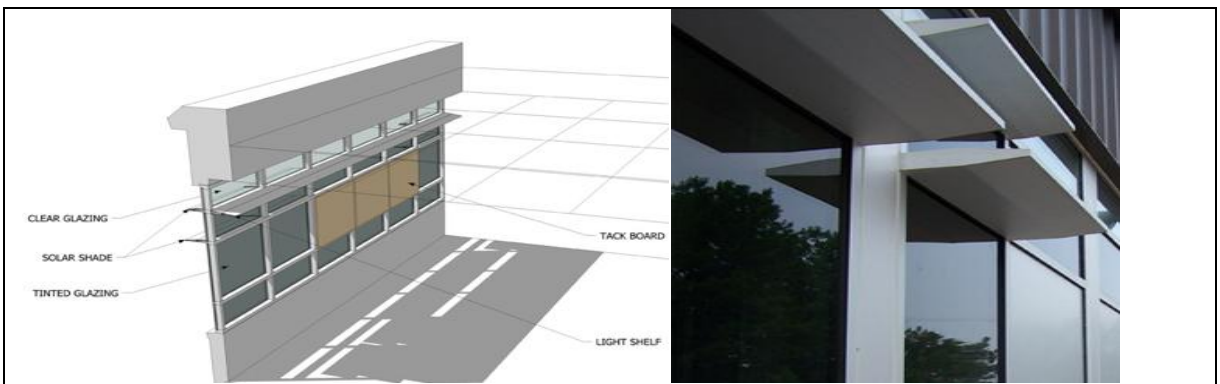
The south Elevations can use horizontal sun breakers. "www.imges.google.com/imghp"
